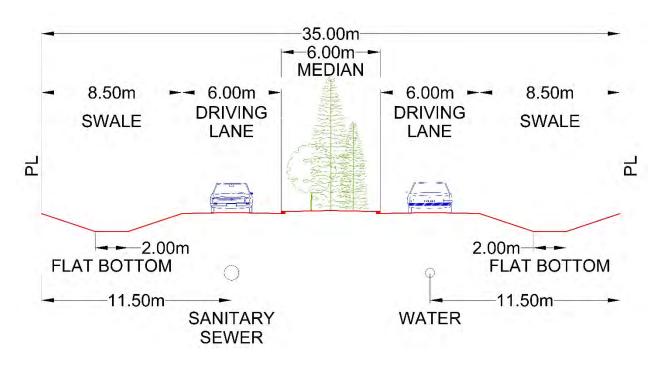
Proposed Modified Road Cross-Section for Strawberry Hills Gate
